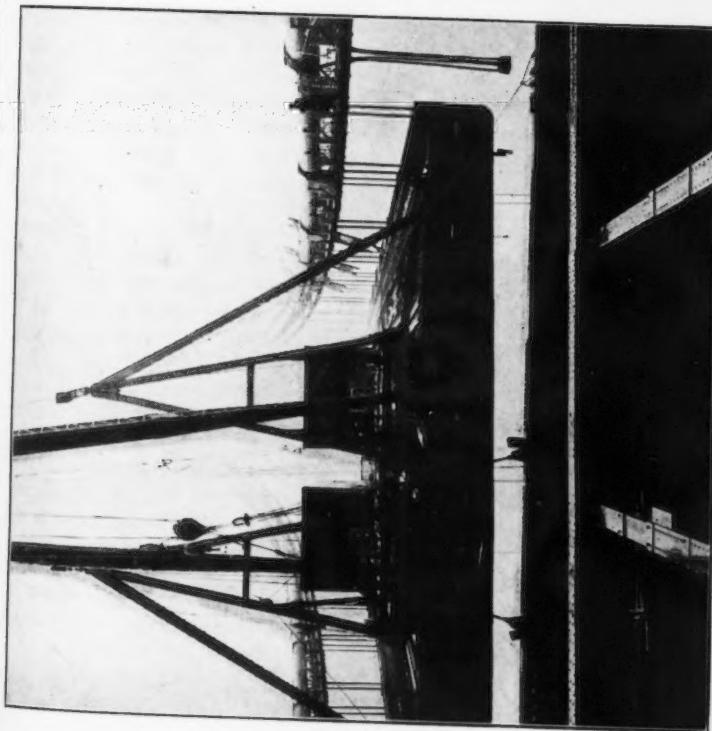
MAIN SPAN TRAVELER, NEW JERSEY SIDE.
